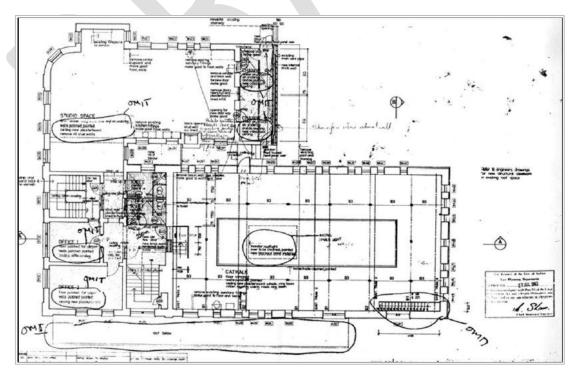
Amended Second Floor plan, approved in 1983, showing the proposed amendments or "omissions". (Source: City of Sydney Archives 539/1/82)
